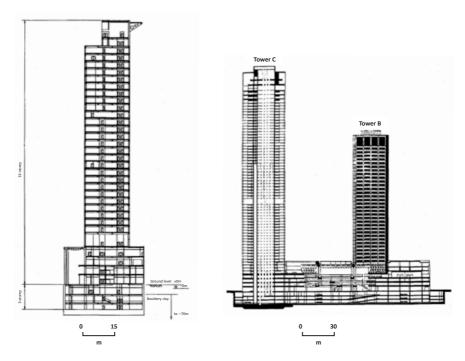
(b). Section showing raft foundation of Hitachi Tower (left) and Swissôtel The Stamford — Tower C (right) [11].
